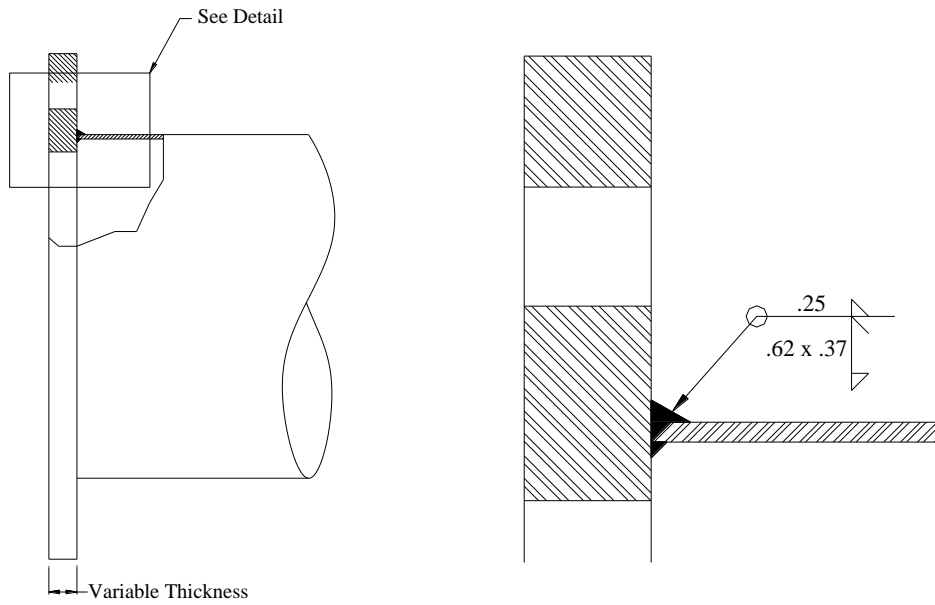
Typical "Texas" HMIP weld detail (Stam, 2009)
